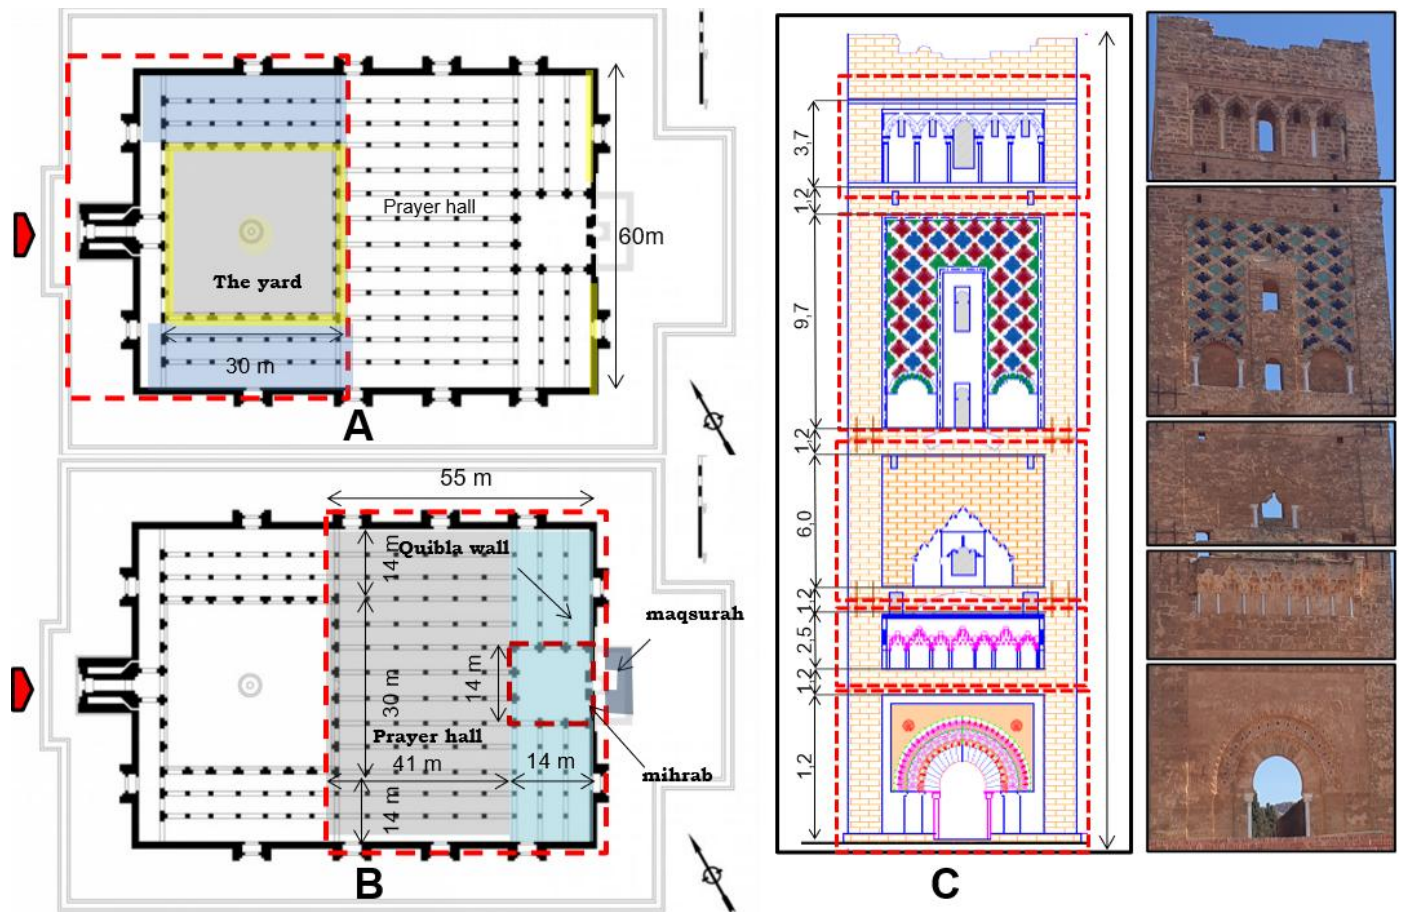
Main façade of the minaret of the Mansourah Mosque and view of the Mansourah Mosque floor plan: A. la cour de la mosquée, B. la salle de prière, C. la façade. (Source: Authors, 2023).
